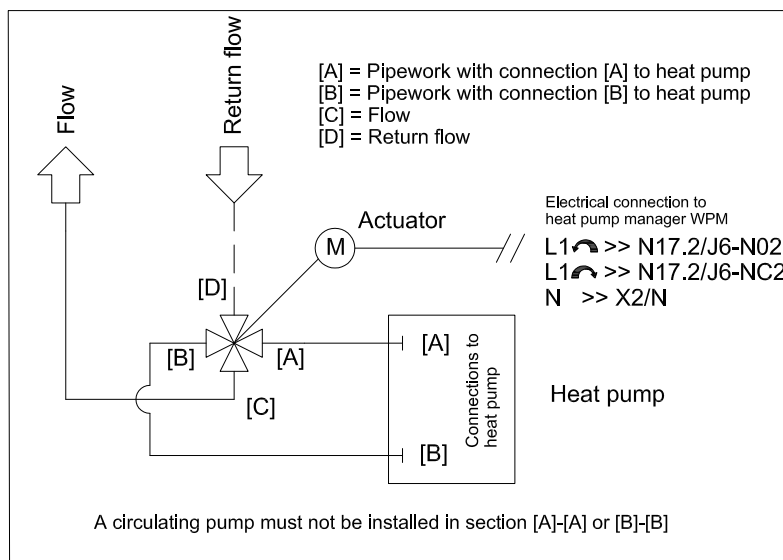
Hydraulics diagram of reversing valve/heat pump
